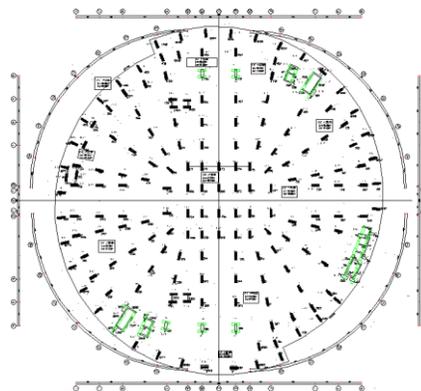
Layout of Columns and Foundations. (Balkar Engineering Group, 2009)
